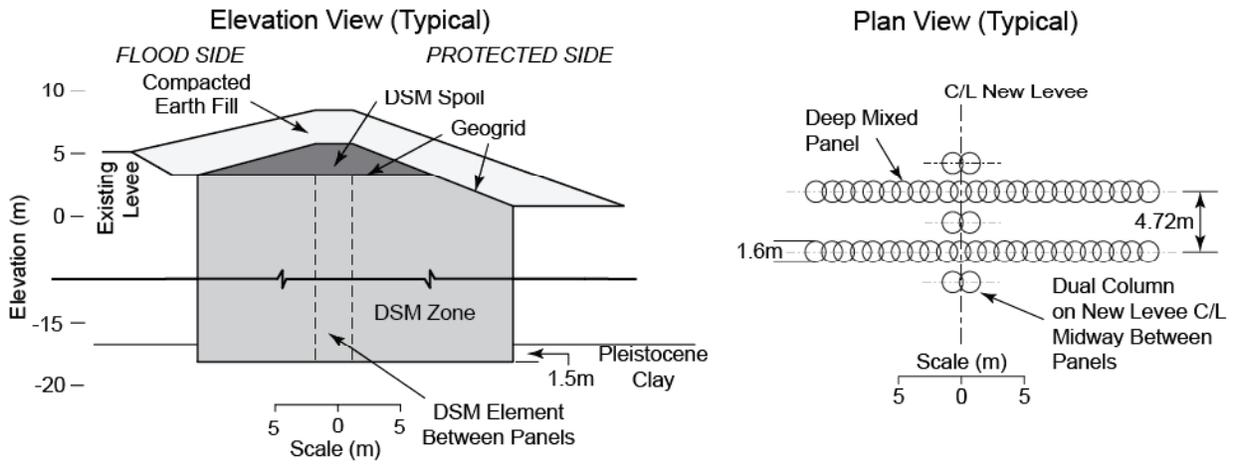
Typical elevation and plan views of the Deep Soil Mixing zone at LPV 111 (adapted from Cooling et al., 2012).
